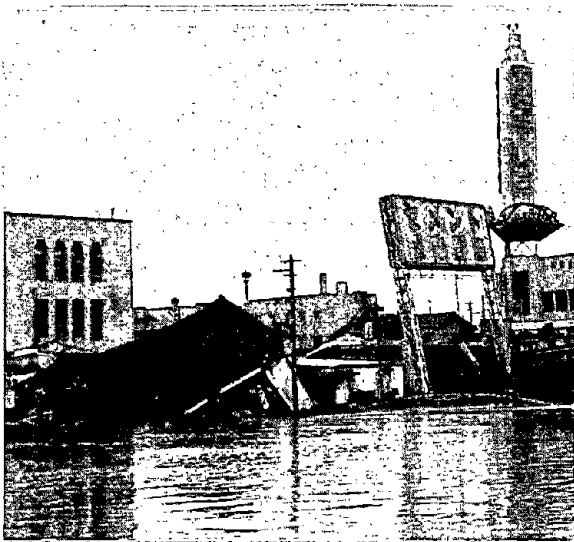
Houses Fallen into the River on the Left Bank of Bandai Bridge
